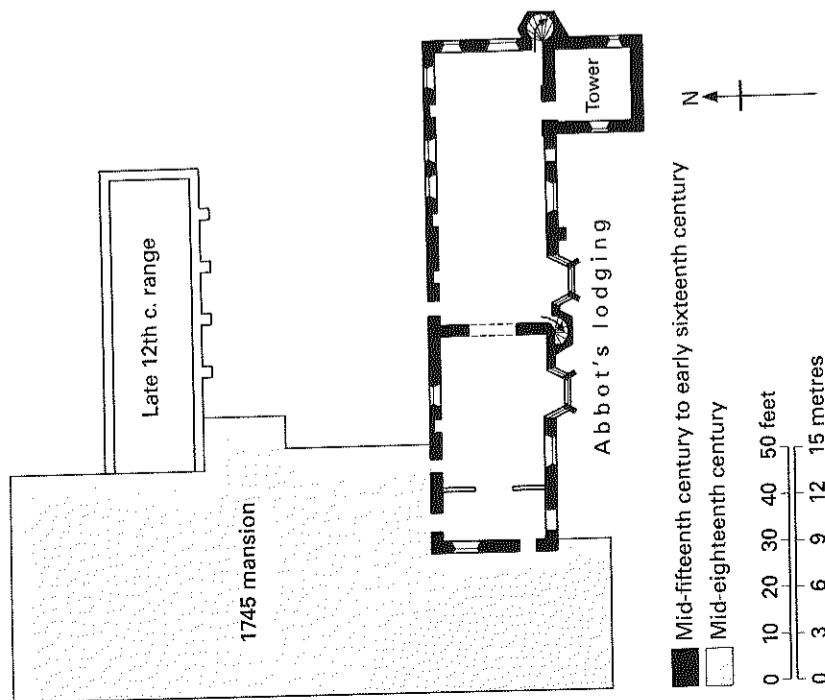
Thame Park: abbots' lodgings, ground plan
